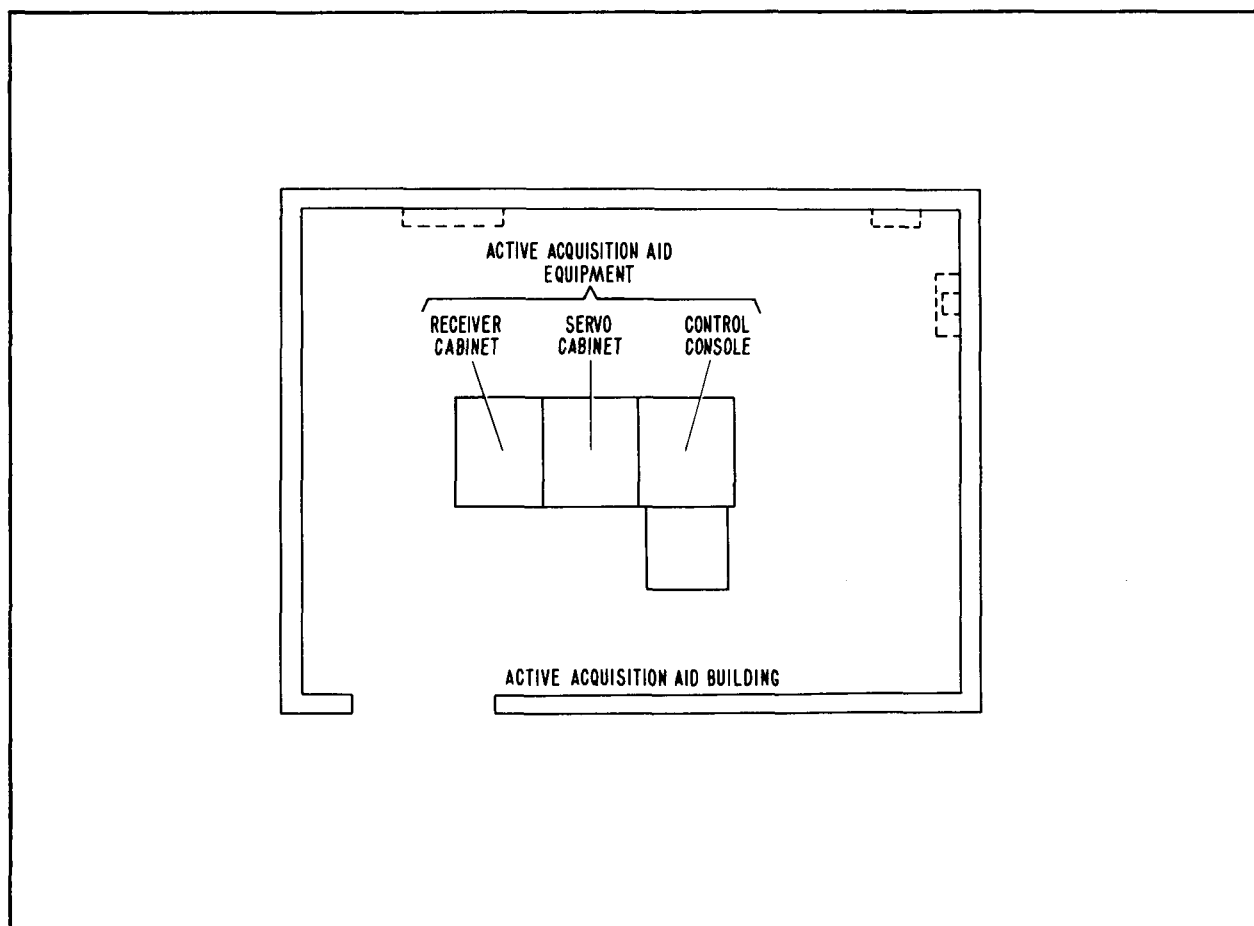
Acquisition System Equipment Layout, Active Acquisition Aid Building
